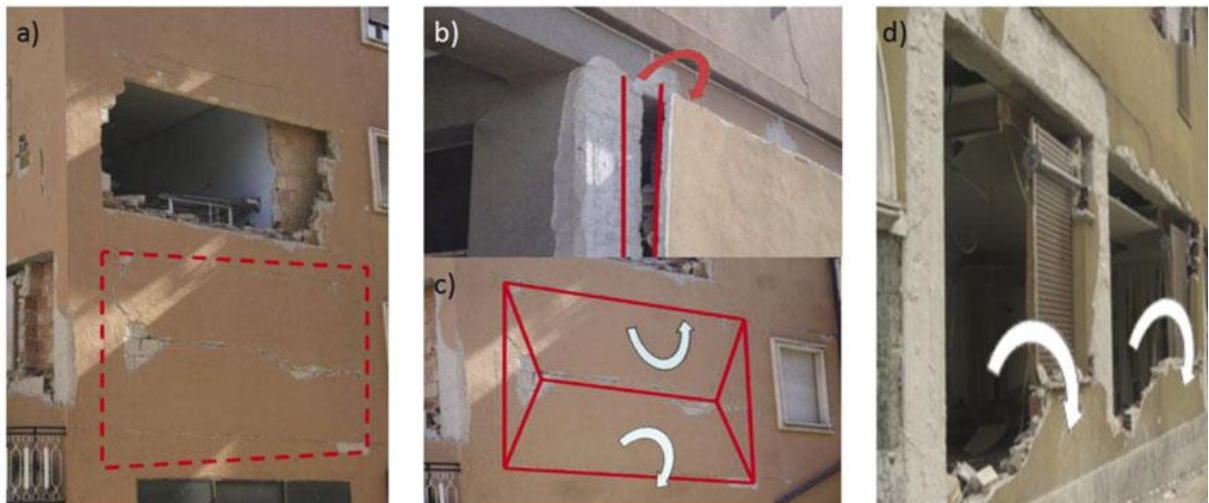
(a) Out of plane collapse of infill walls; (b) Wall panel rotation; (c) Horizontal hinge formation; (d) Total collapse of the single leaf wall [1] L' Aquila.
